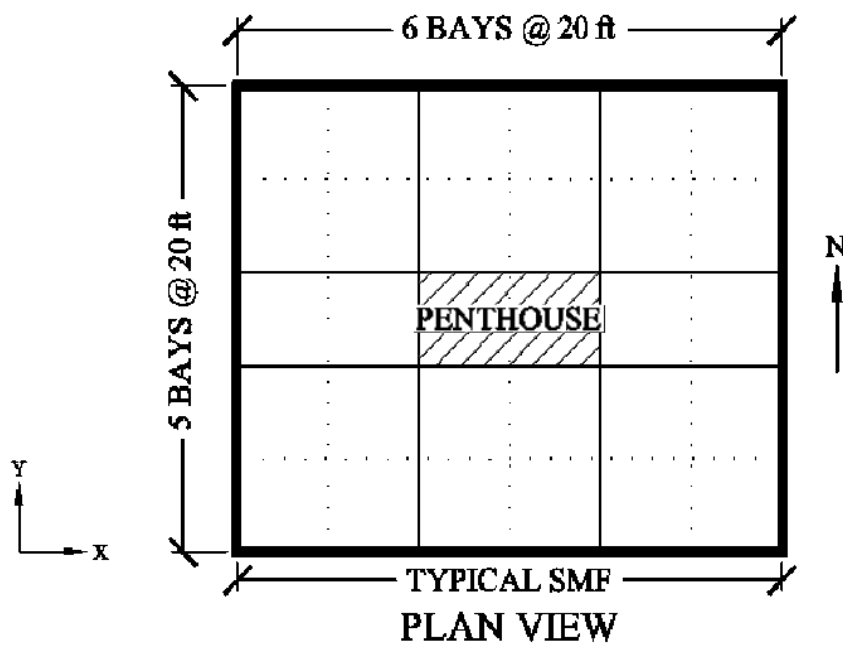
Roof plan view, 20-story office building used in Pekcan et al. study.
